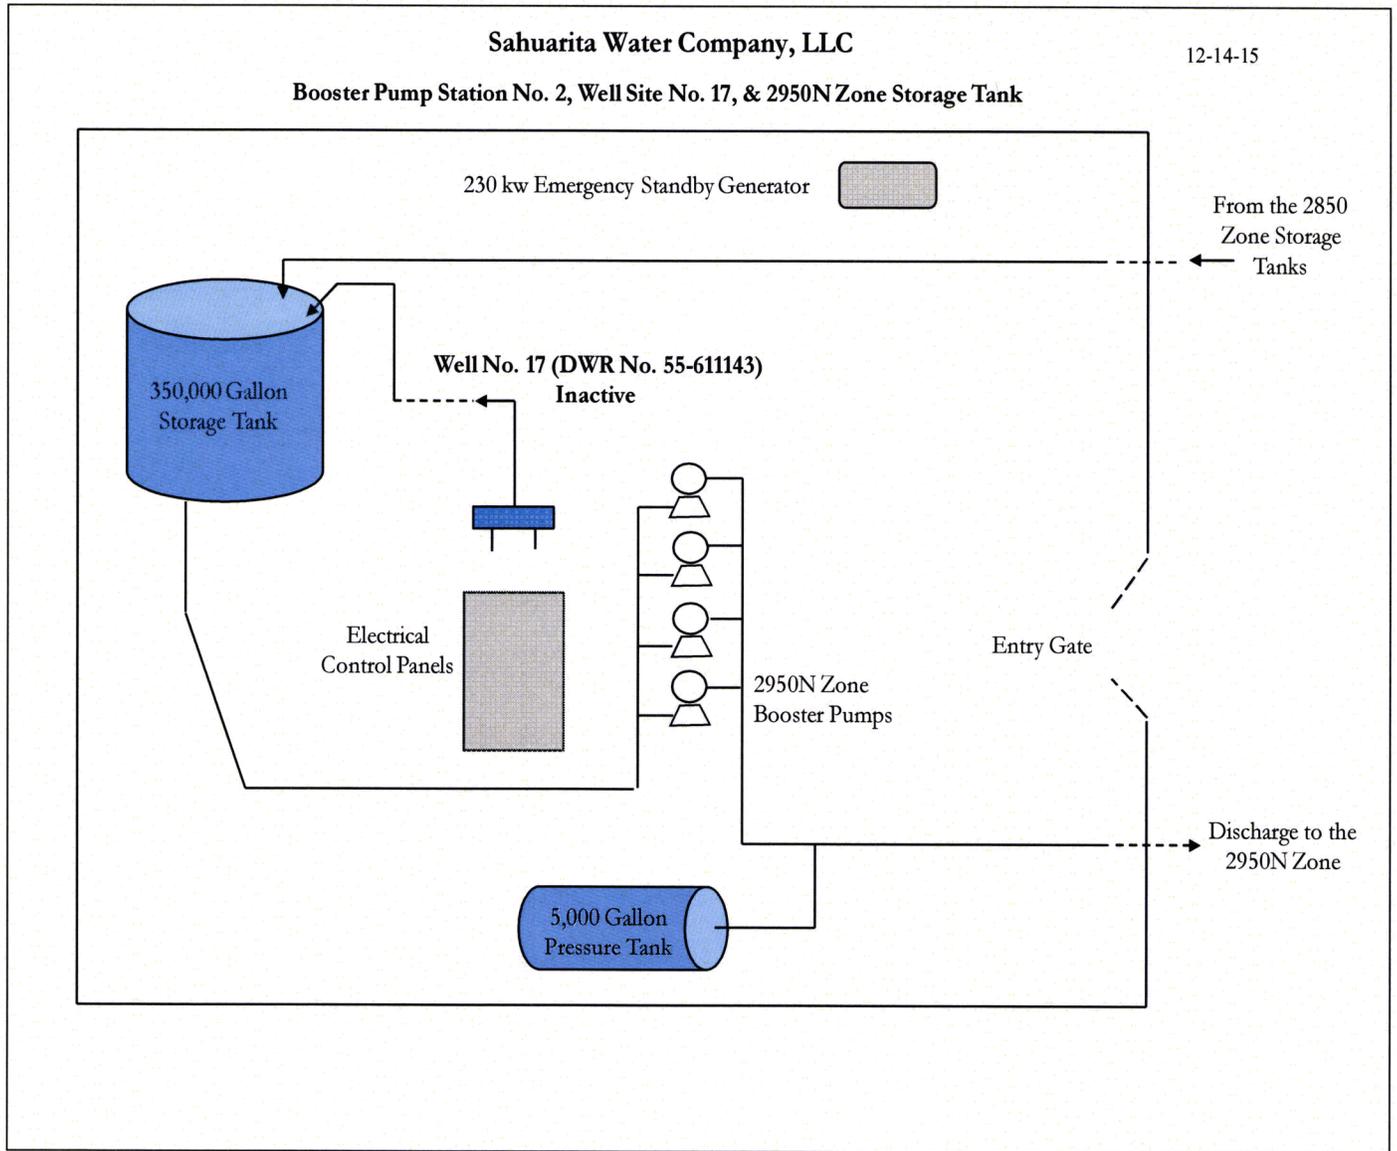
BOOSTER PUMP STATION NO. 2 AND WELL SITE NO. 17
